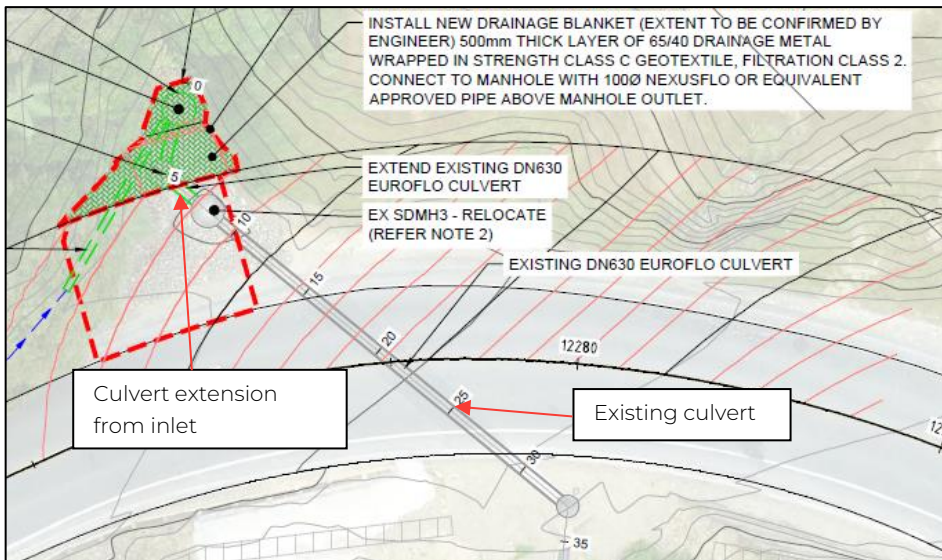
Site D1 existing culvert shown in grey and new extension, manholes and drainage blanket scruffy in green.
